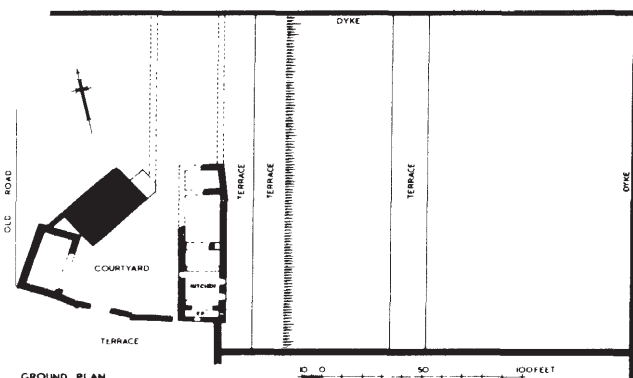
Whytebank Tower, Ettrick & Lauderdale District: site plan (copyright RCAHMS)
